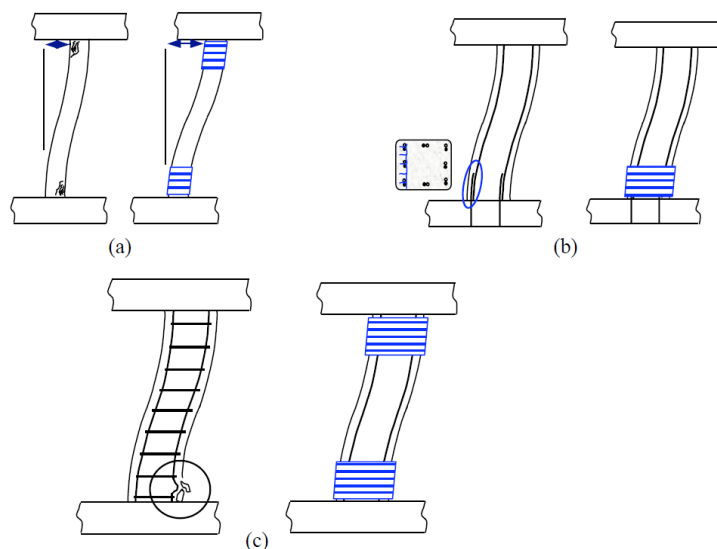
Confinement of RC element with composite materials to: a) increase lateral deformation; b) prevent lap splice failure; c) delay rebar buckling
